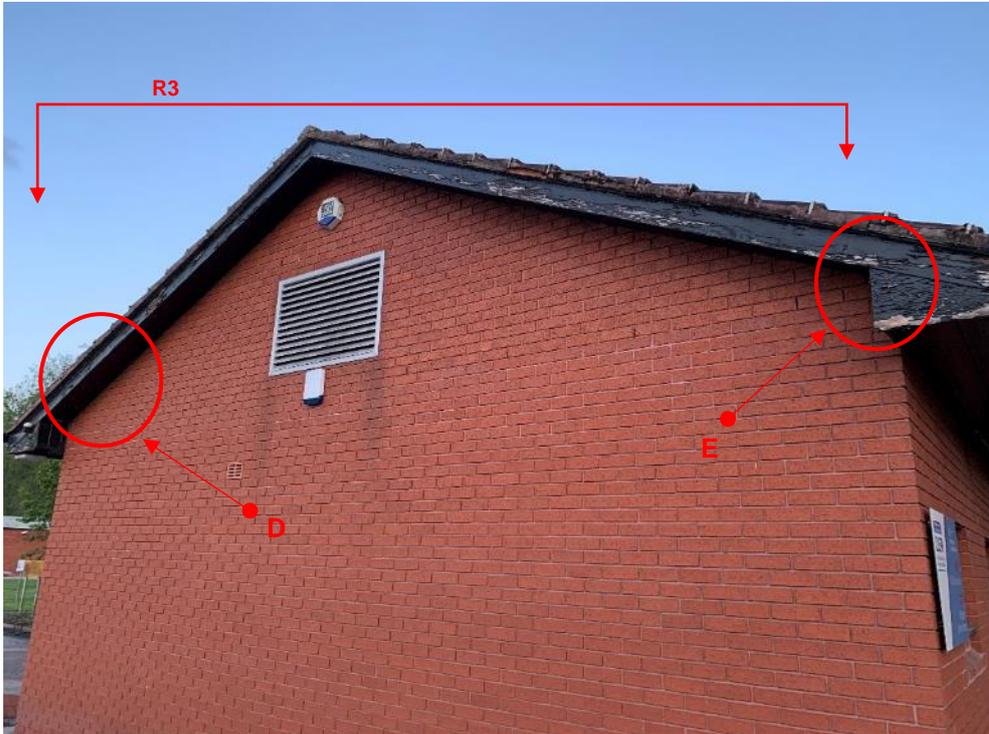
B15, Location of Roost 3 (Common Pipistrelle), at the eaves of B15 (East elevation).
